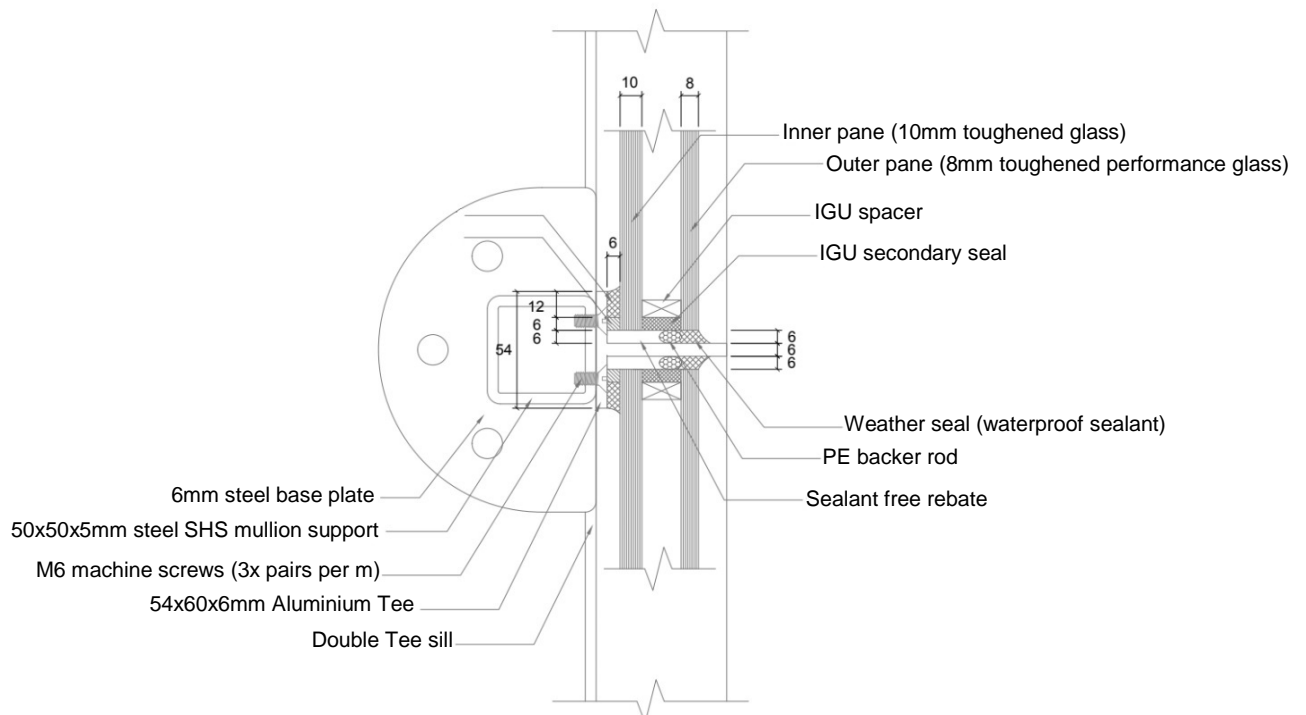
Typical section of the modified fixed glazing system (not to scale)
